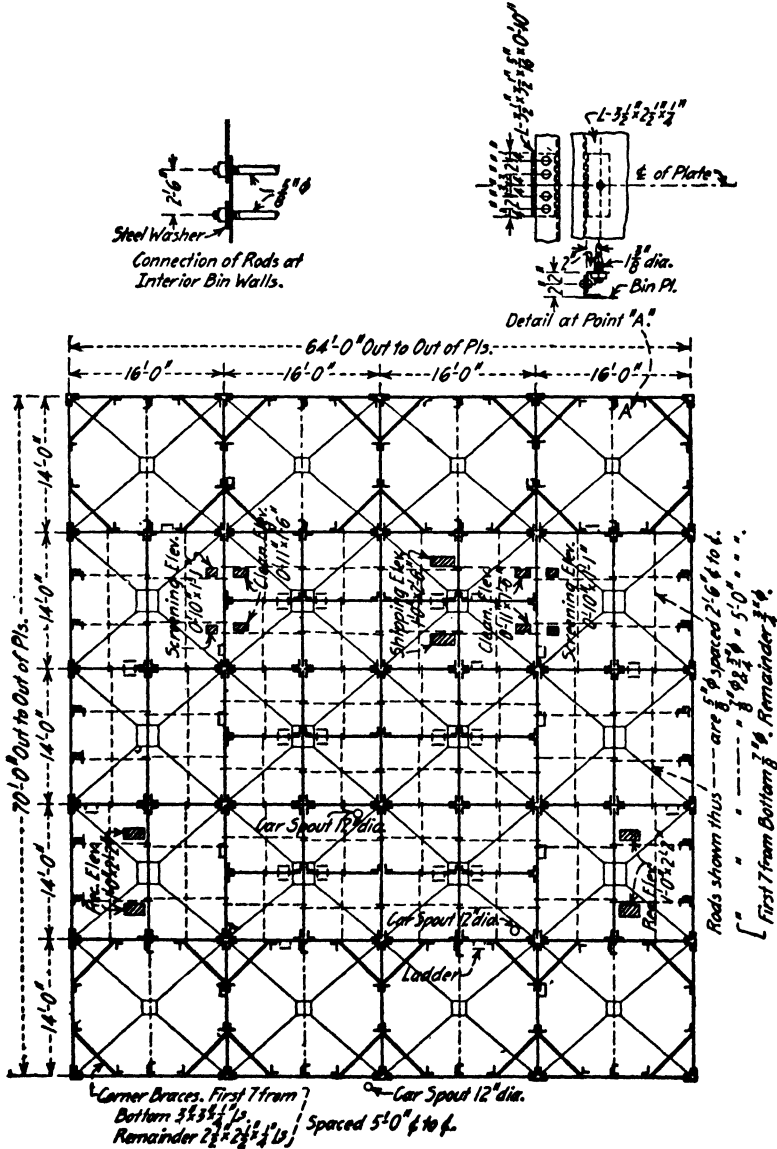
PLAN OF BINS IN WORKING HOUSE OF INDEPENDENT ELEVATOR.
